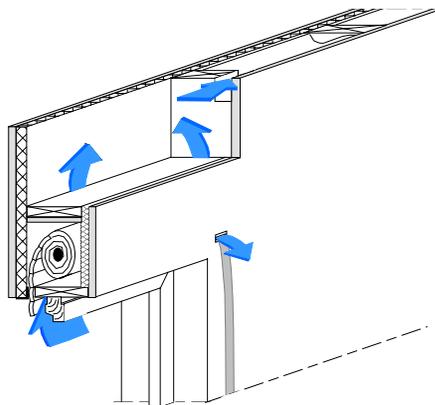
Possible leakage paths through the shutter box into the wall of timber frame buildings.
